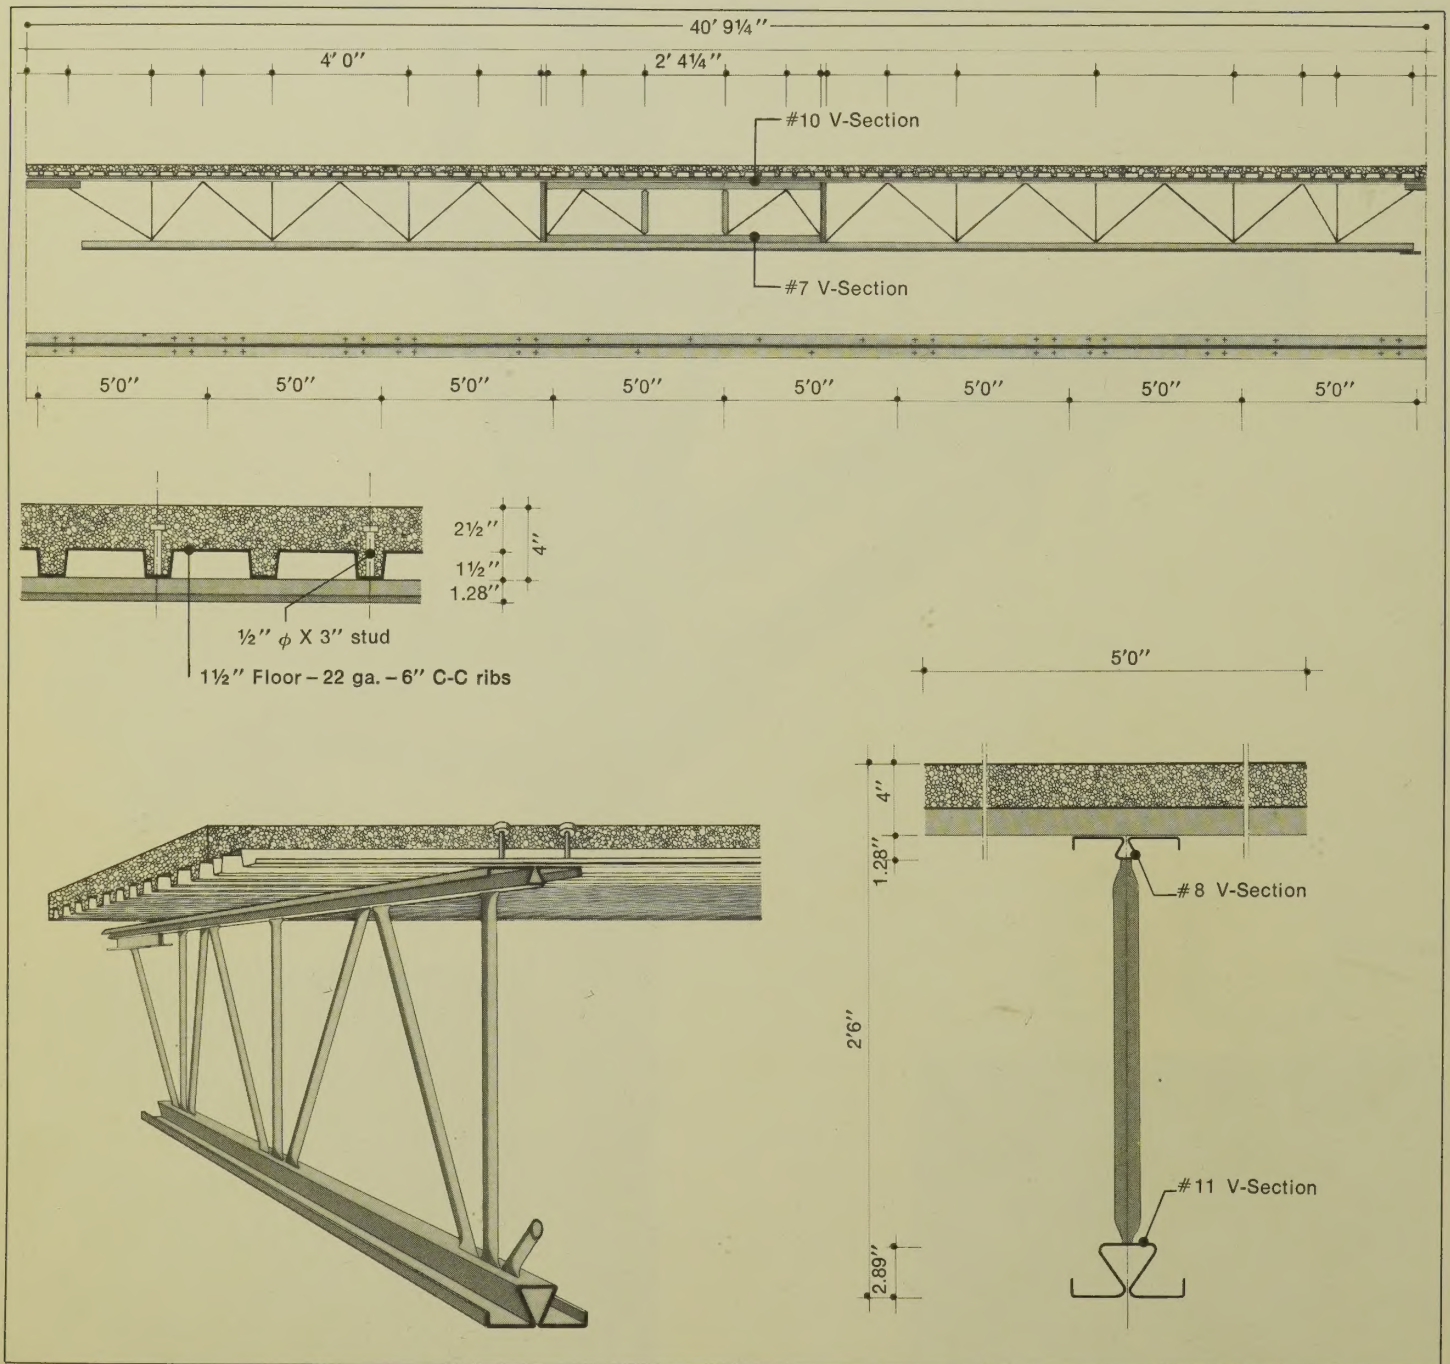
Composite open web steel joists as used on the Stelco Tower. Also a view of Stelco Tower floor. The 4-inch concrete slab consists of nominal 3000 psi concrete, 1/2-inch shear studs (3-inches long) welded through the steel floor to the top chord in pairs at locations as shown.
